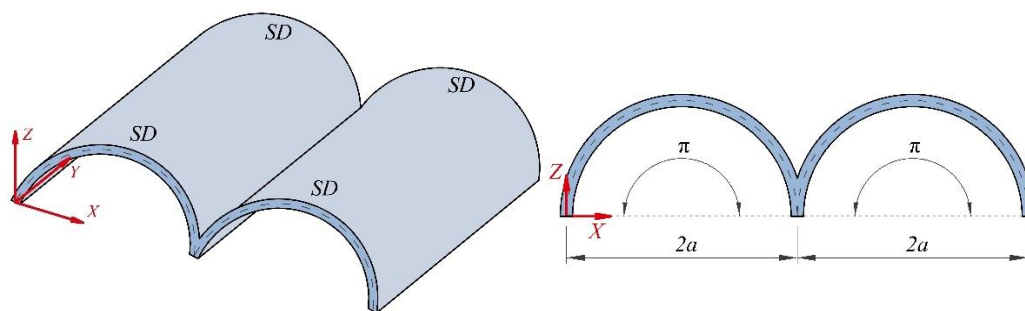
Disposition of a barrel roof (drawing by author, created in AutoCAD)
